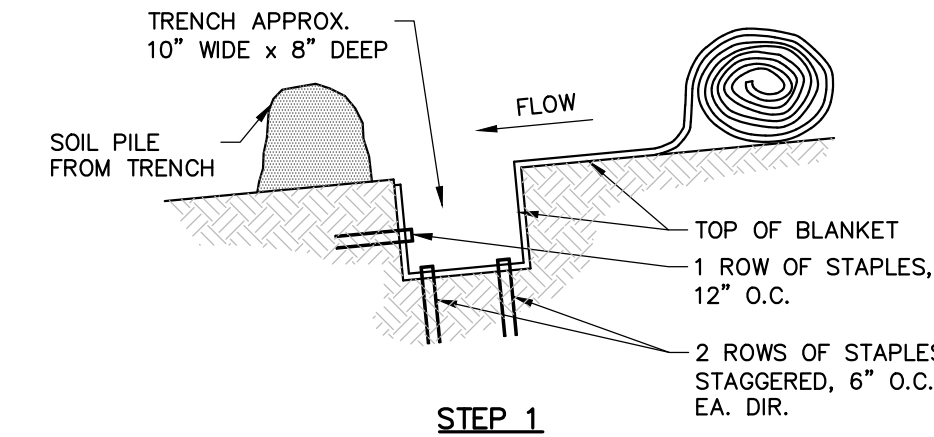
DETAIL B - SECTION VIEW TERMINATION NOT TO SCALE
